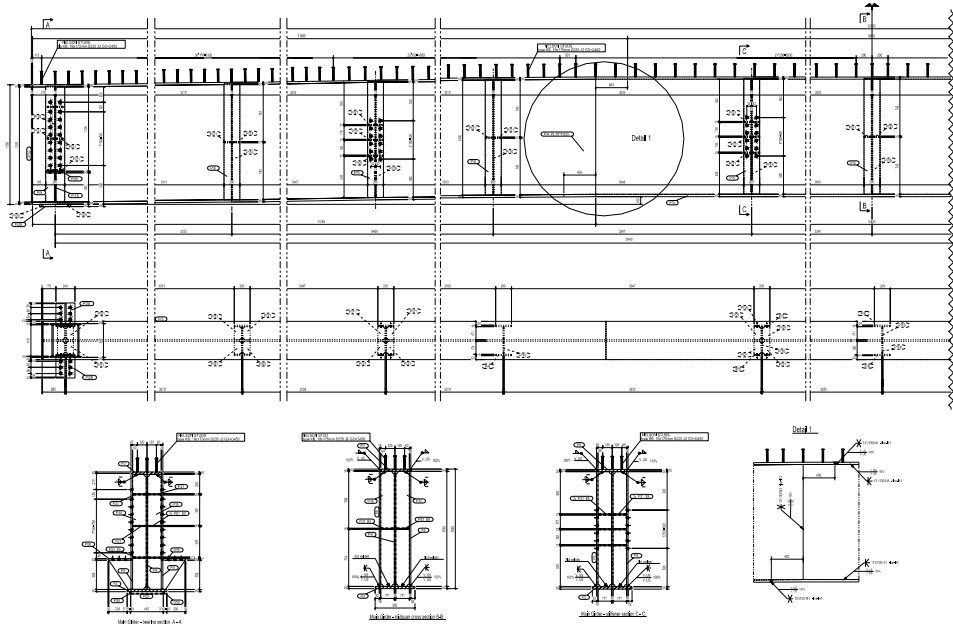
Bocsă-Ramna road bridge: welded built-up main girder
